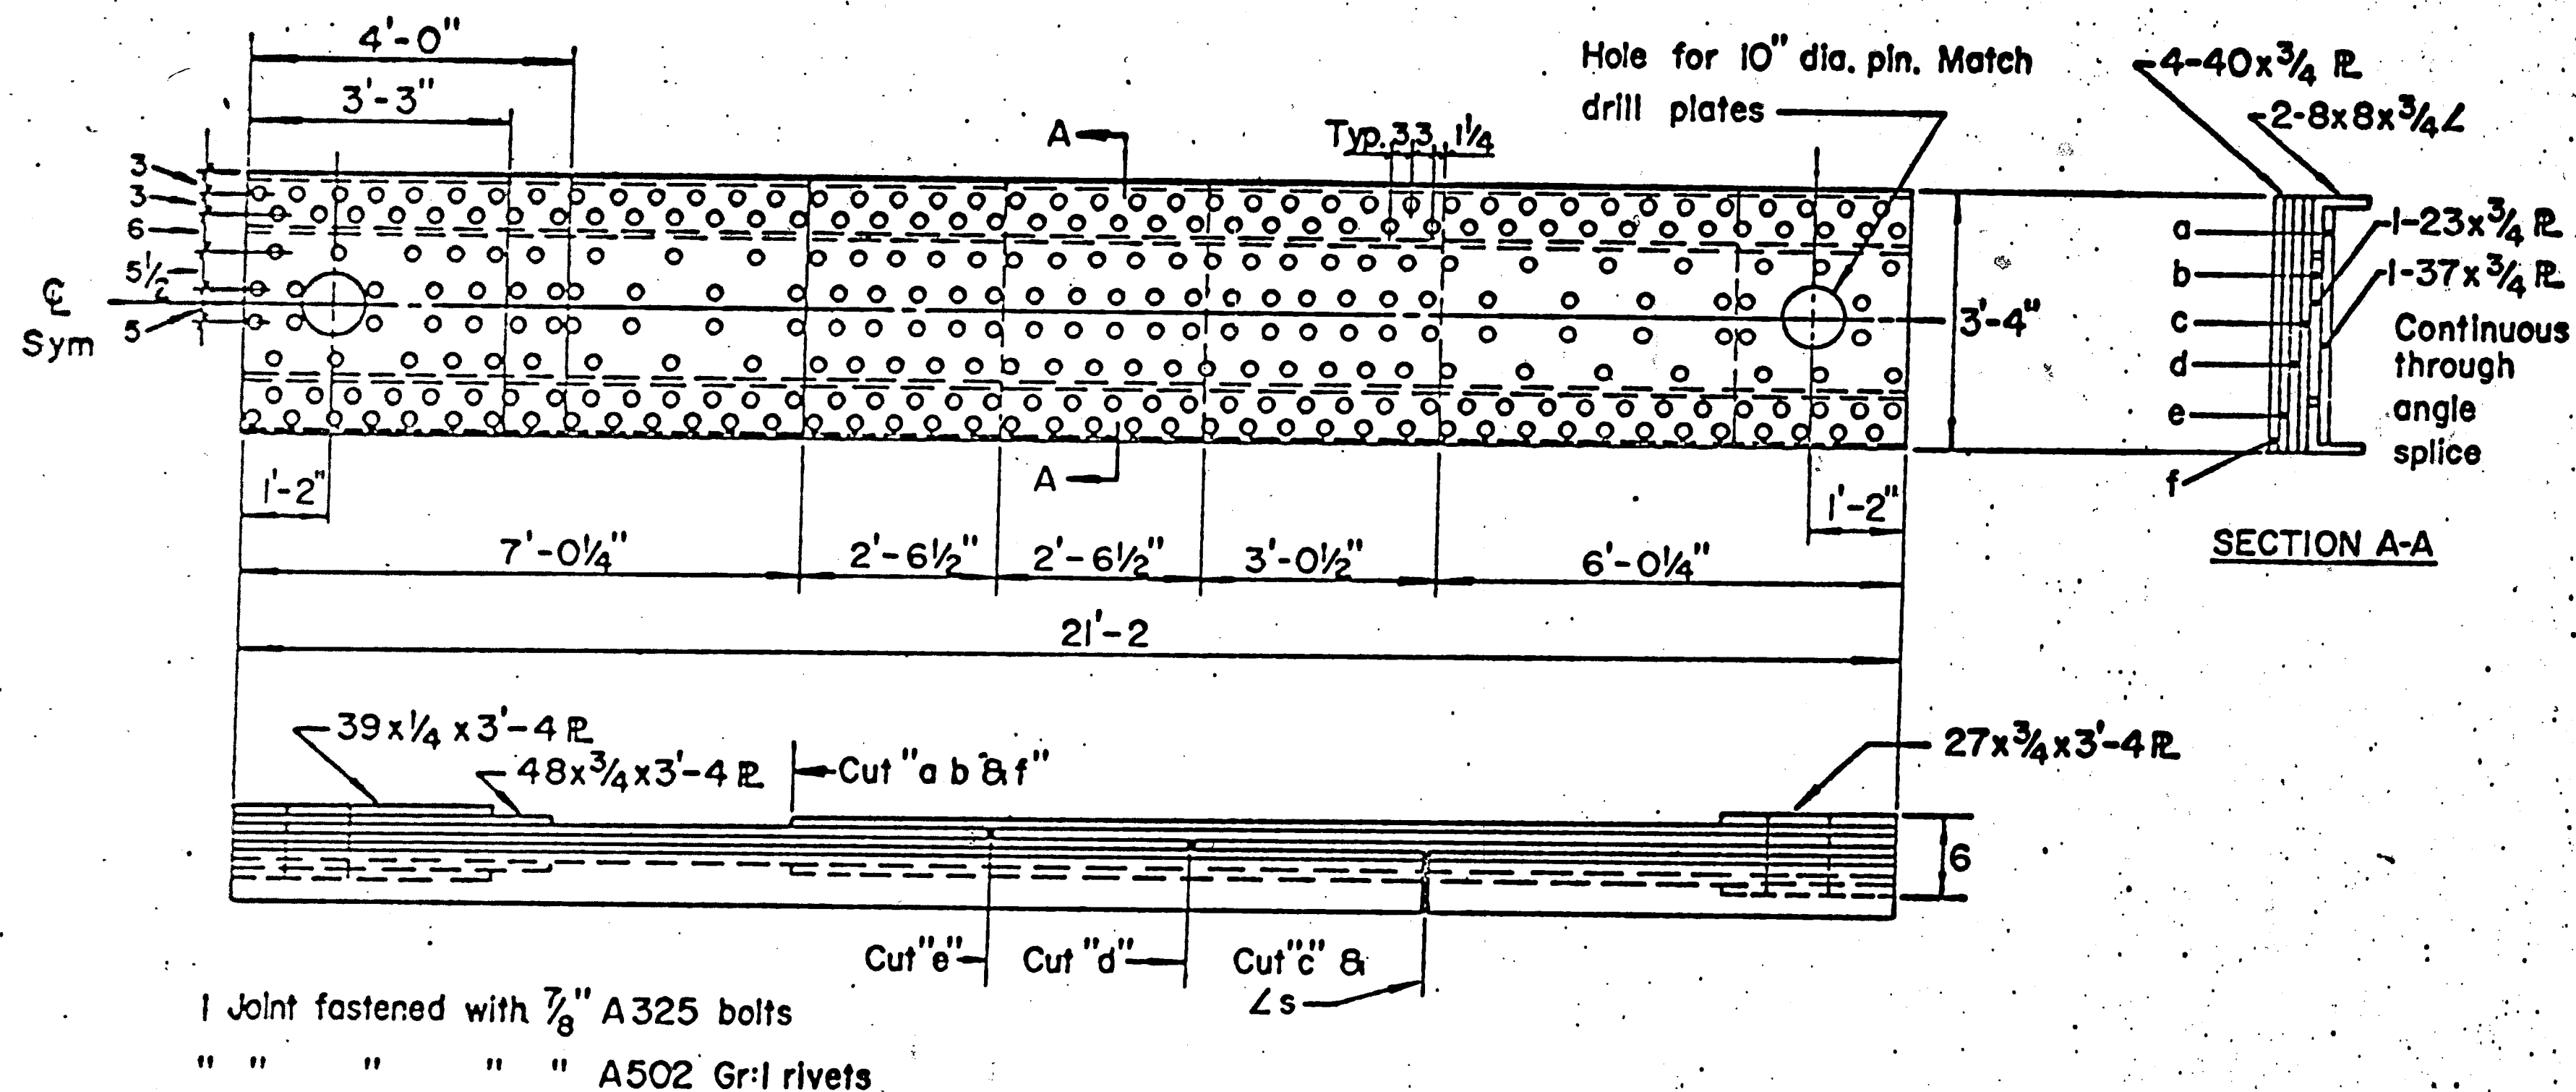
TYPICAL TRIPLE-PLATE SHINGLE JOINT
